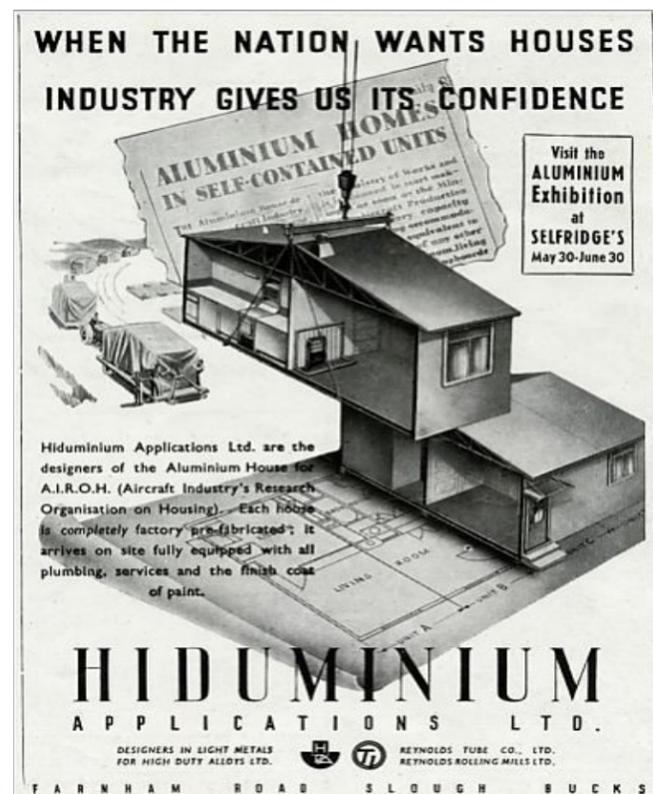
AIROH HOUSE ADVERTISEMENT. EVANS, M.
